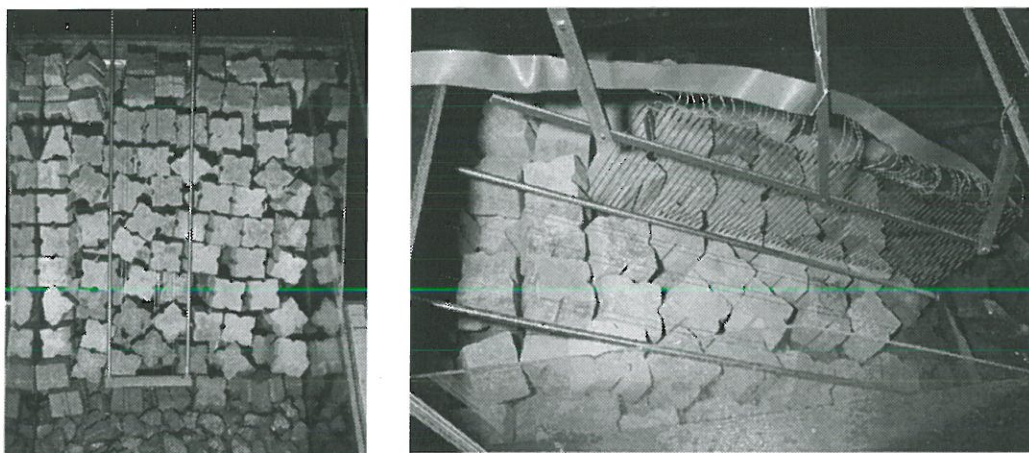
Run-up gauges : (a) sloping gauges, (b) stepgauge.
